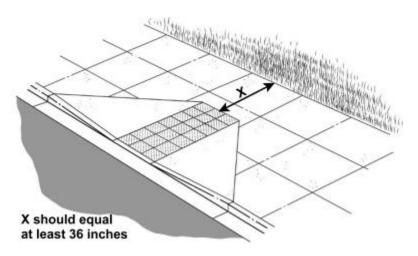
Landing (Source: ADA Accessibility Survey Instructions Manual)
